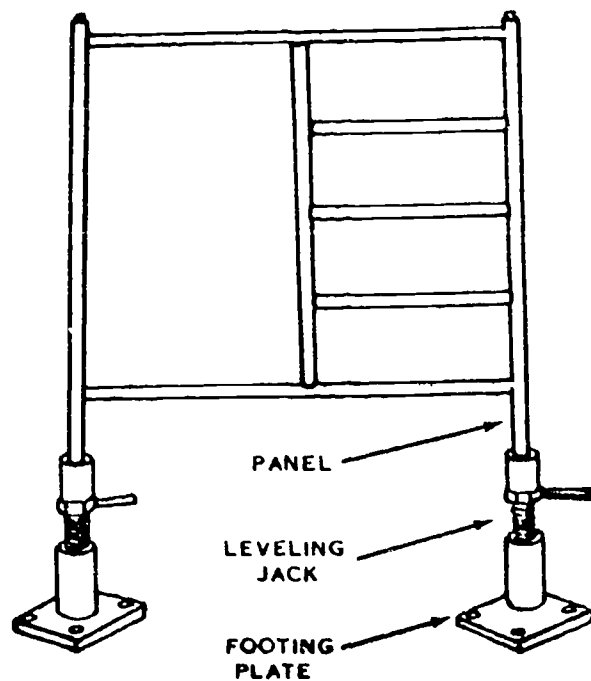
Install Leveling Jacks and Panels into Footing Plates
